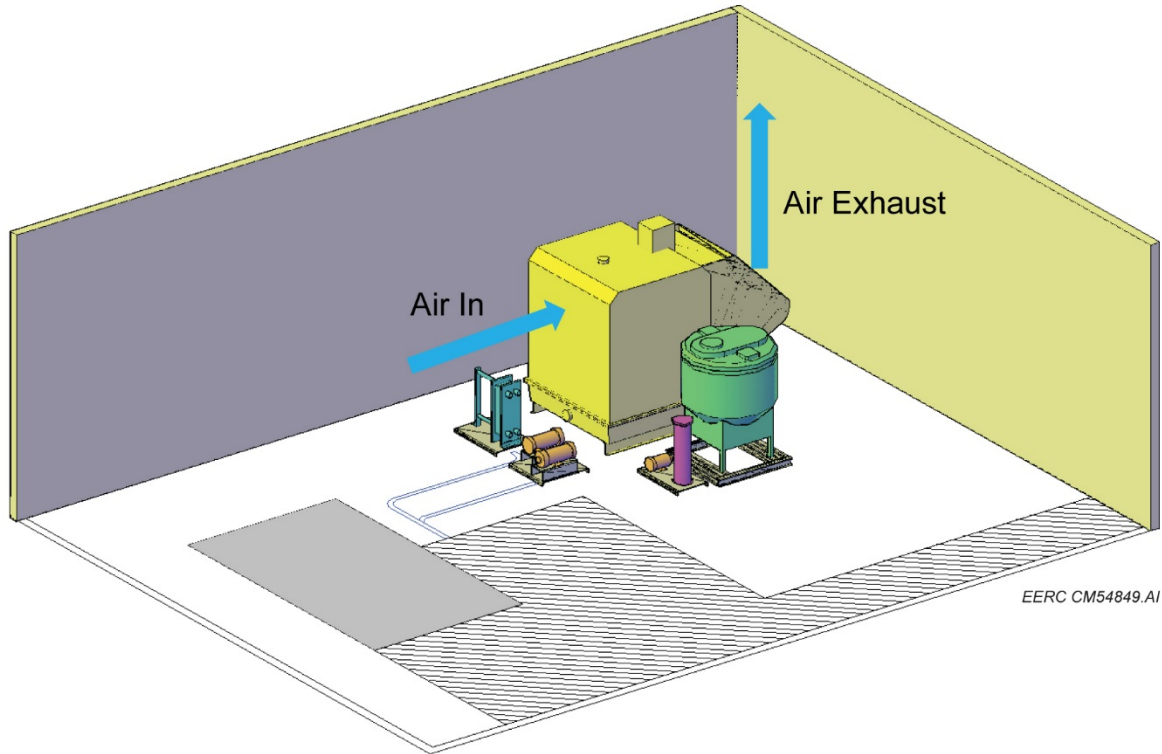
Three-dimensional equipment layout within the walled enclosure of Fort Irwin Building 263.
